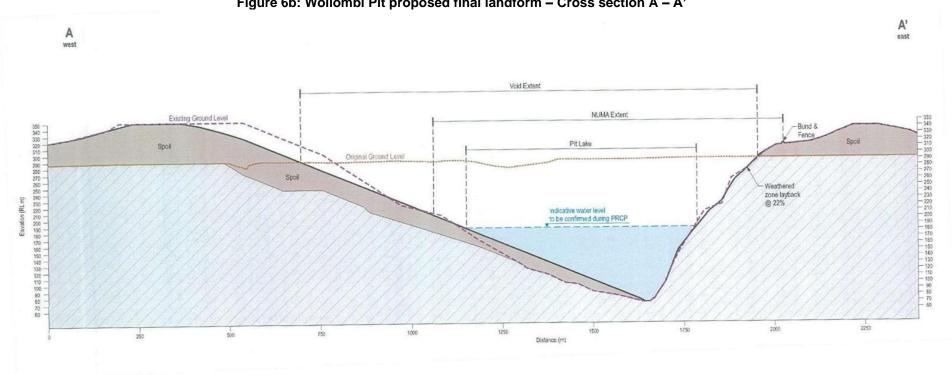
Wollombi Pit proposed final landform – Cross section A – A'
